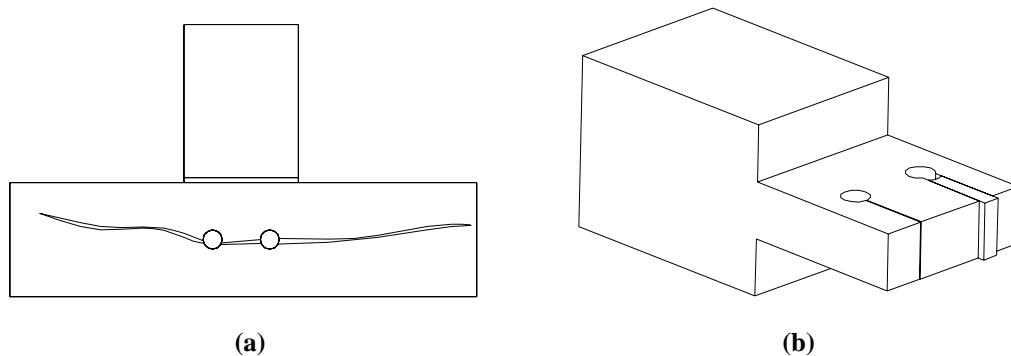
(a) Mortise Splitting Failure (b) Tenon Relish Failure
